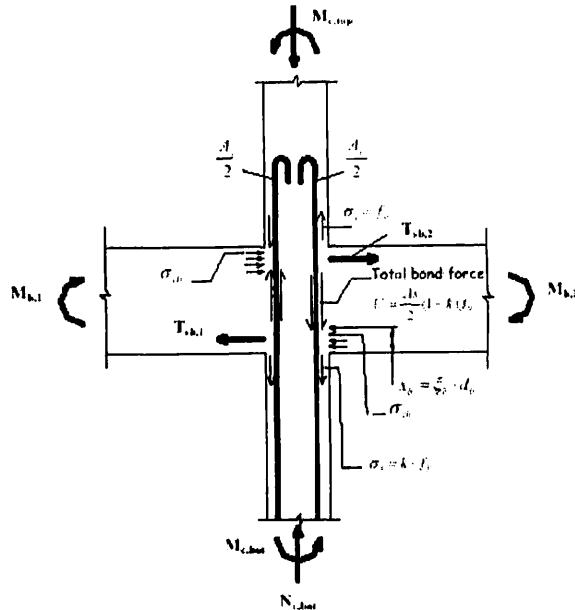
Column bars anchored through the joint, terminating in hooks (Calvi et al. 2002)
